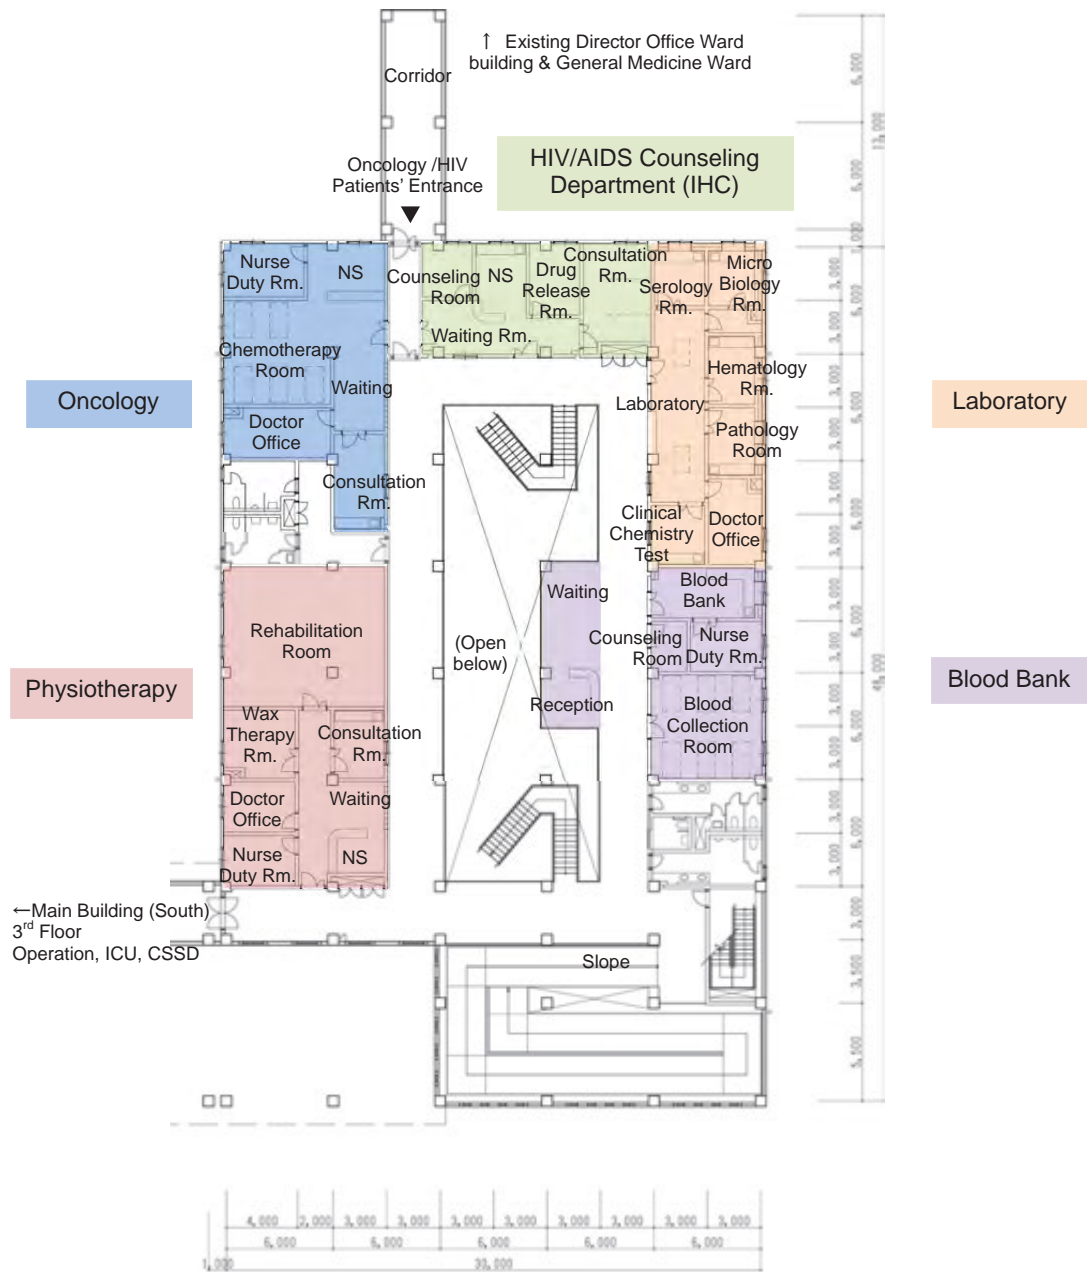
Main Building (North) 1<sup>st</sup> Level Floor Plan
